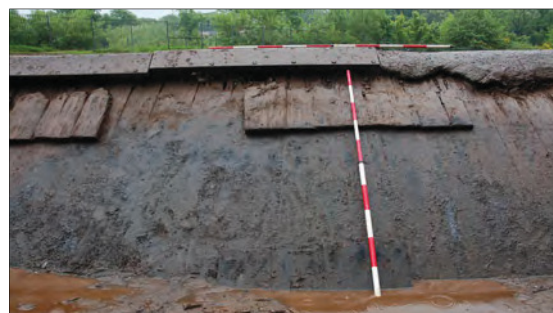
Bitumin coating 009 on weir face and repair section 007.
